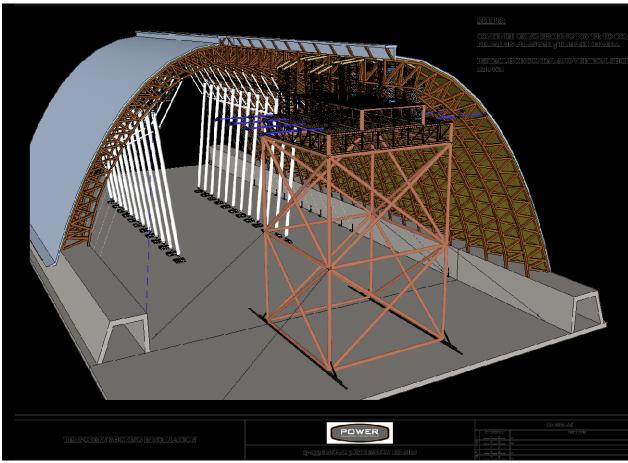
Isometric of Temporary Shoring & Shoring Tower
